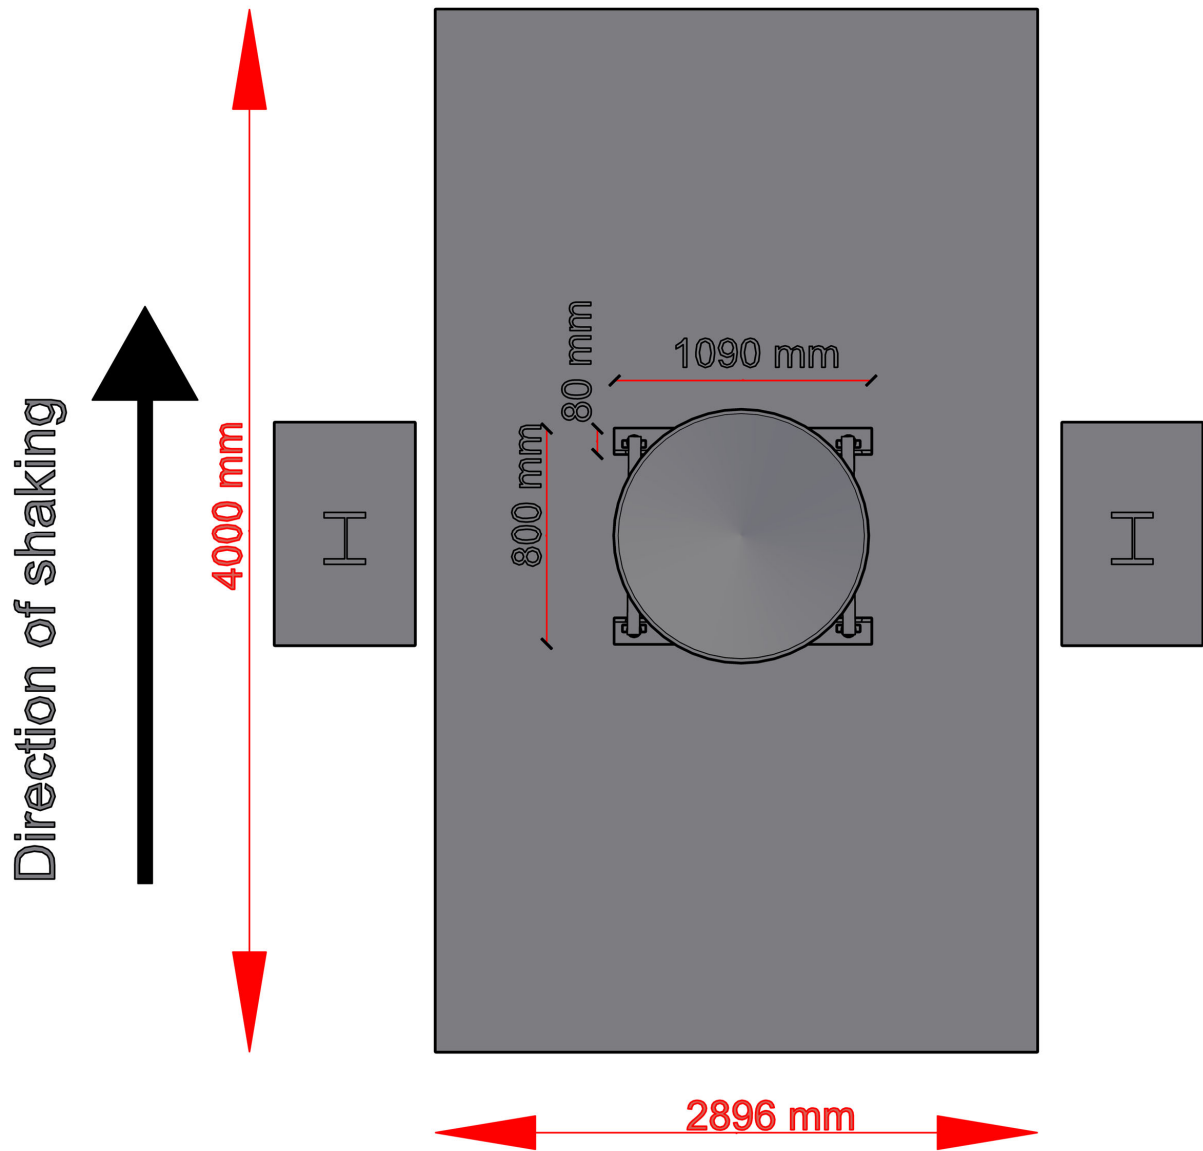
Plan view of the shake table, fluid tank connections, and supporting columns
